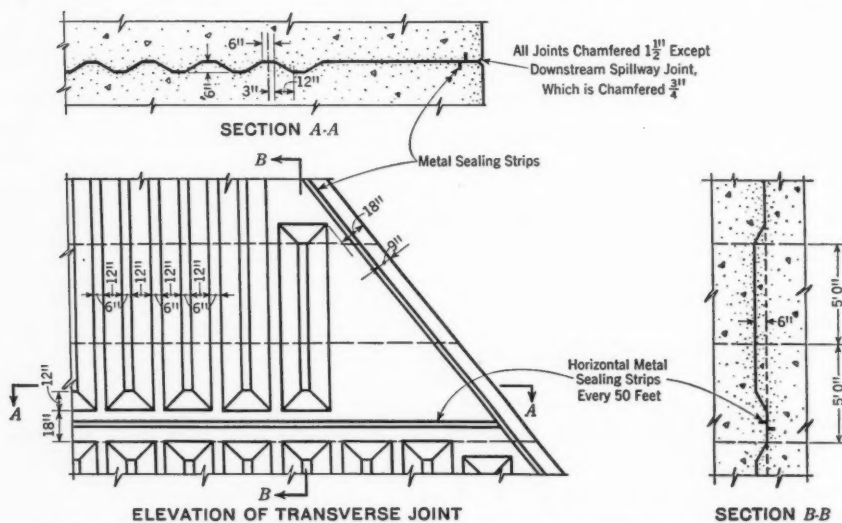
TYPICAL CONSTRUCTION-JOINT DETAILS FOR DAMS OF THE BUREAU OF RECLAMATION
